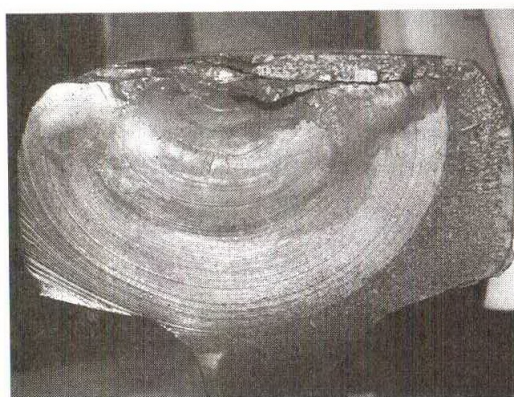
Example of transverse fatigue crack of the railhead. Rail removed from single track [1].
